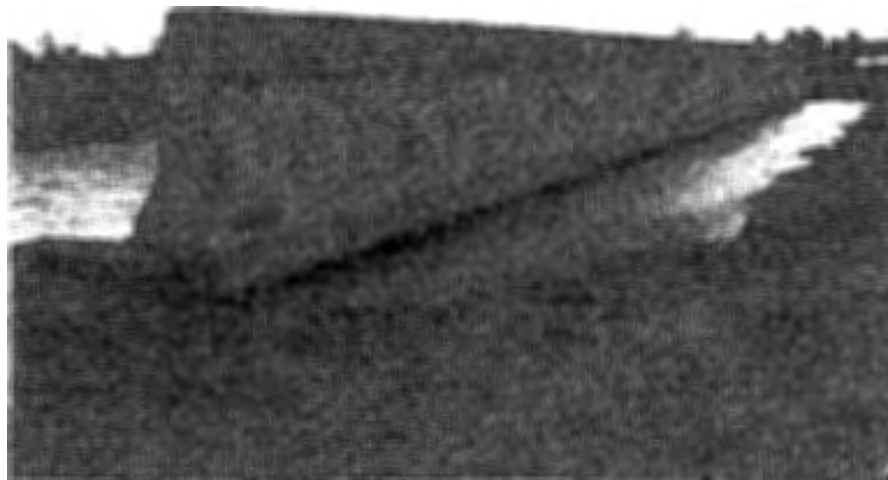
42-in (1.07-m) F-shape bridge railing before test 7069-7.
